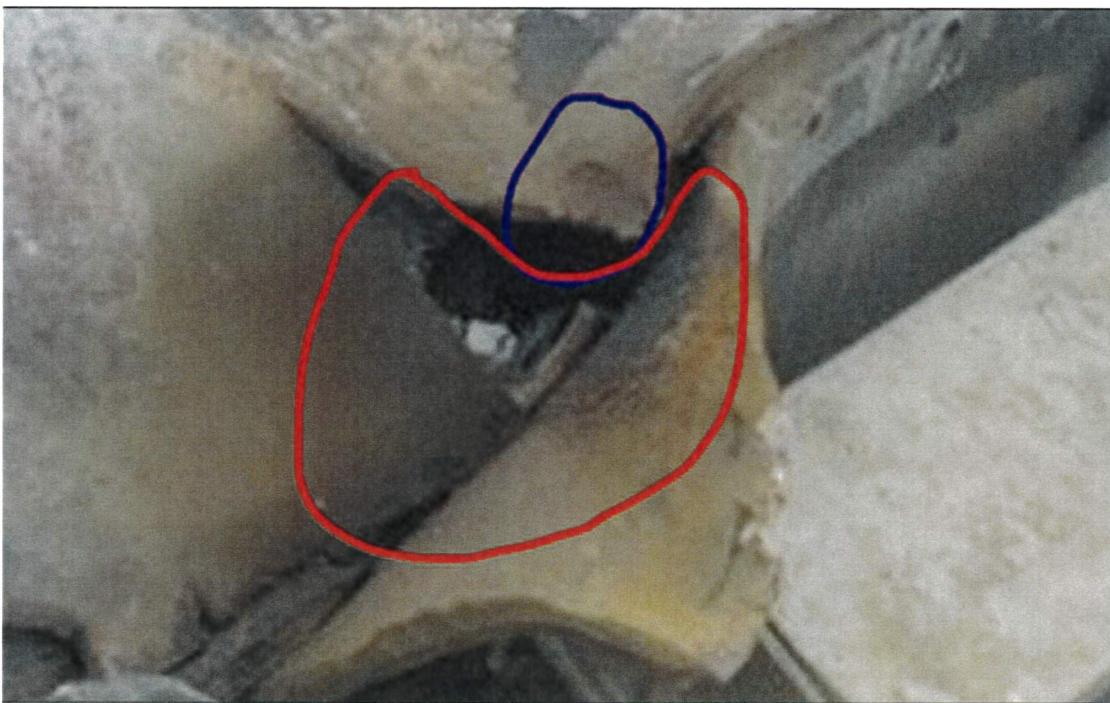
Detail explosion hole - file : 230307_123509.jpg
